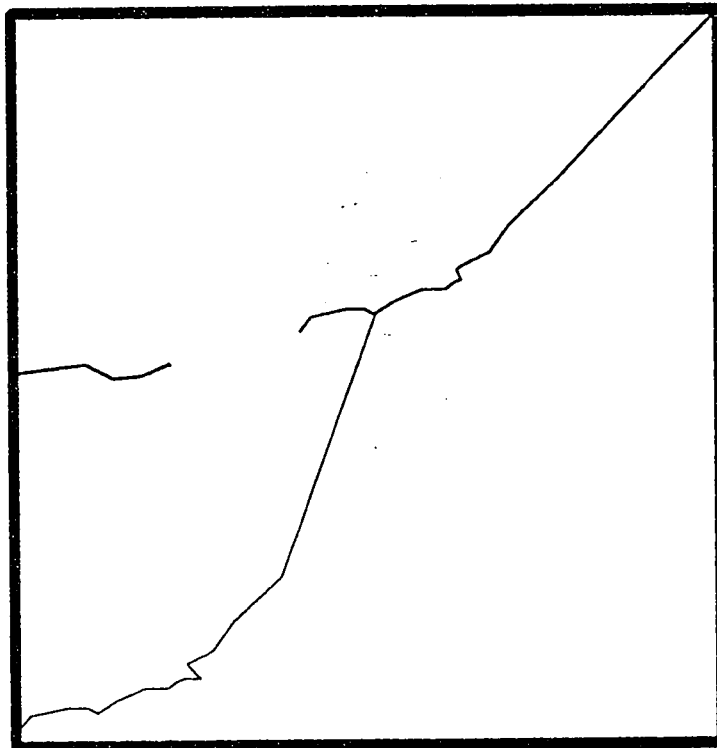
Typical Plastic Shrinkage Cracks in the Concrete Specimens Exposed to a RH of 50 % and Temperature of 45 °C
